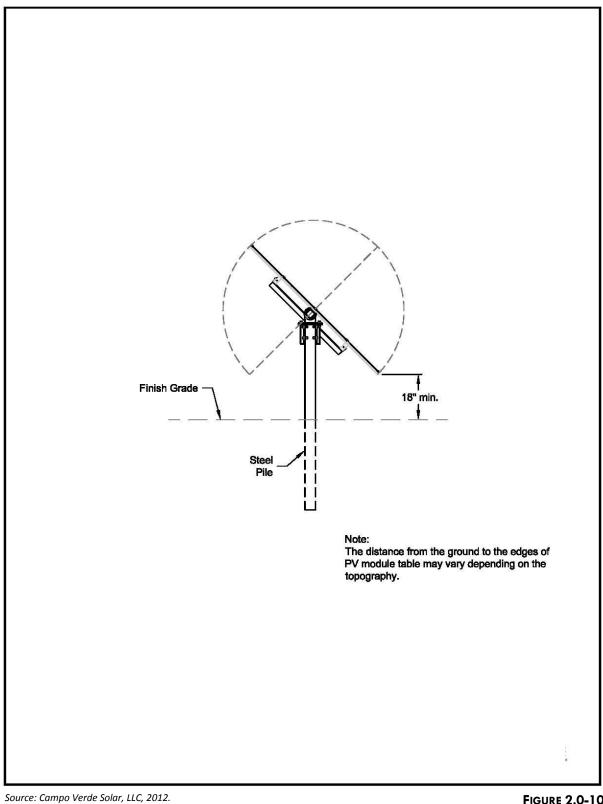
TYPICAL DETAIL HORIZONTAL TRACKER STRUCTURE
